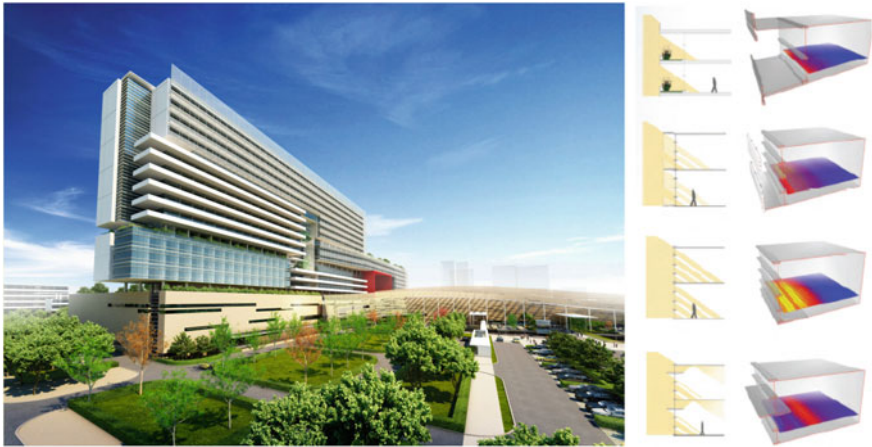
First People’s Hospital of Shunde, Foshan District—Four external wall systems: 1. Window wall system with balconies provides viewing garden and minimises solar and heat exposure to rooms facing south. 2. Glass curtain wall system with sun shading screens maximises visual connection while filtering sunlight in, reducing solar exposure. 3. Low emission insulating glass curtain wall system used predominantly on the north façade. This maximises indirect sunlight and views to the outdoors. 4. Low-emission glass curtain wall system with light shelves provides controlled shading while deflecting natural light deep into the room (*Source* HMC Architects + Foshan Shunde Architectural Design Institute 2012)
